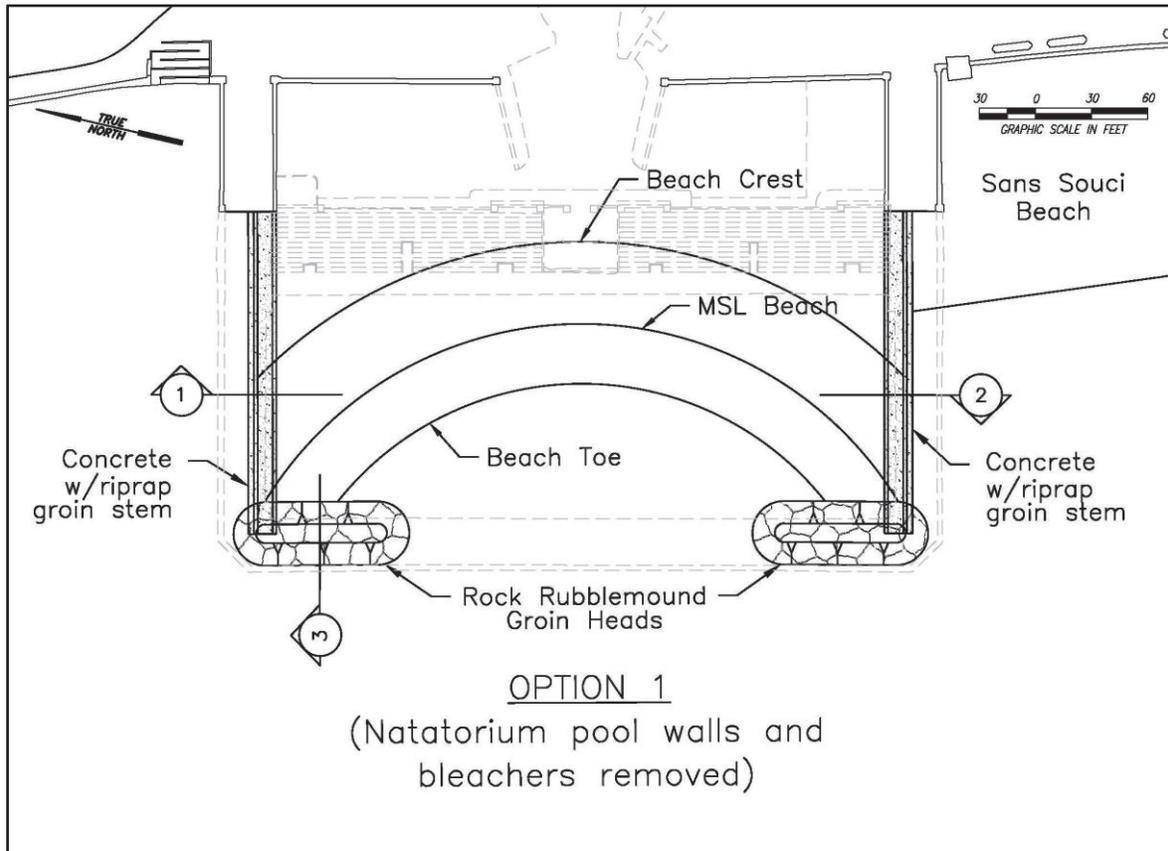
Plan view – Option 1 with pool walls and bleachers removed.
